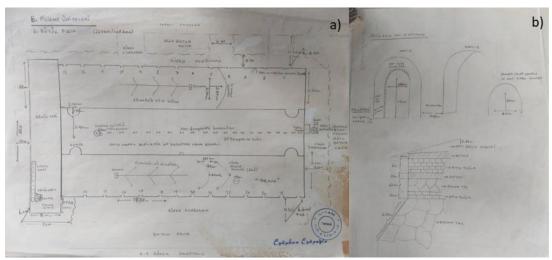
Yuvam Brick Factory Baking Unit Plan and Kiln Belt Details (Eyüpoğlu E.)
